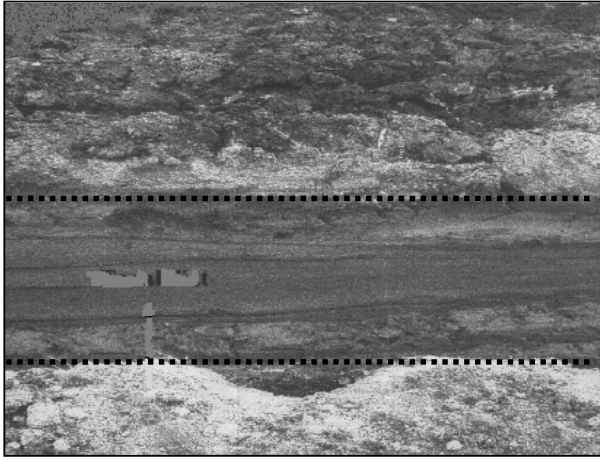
Soil Layer Under Leachate Collection Pond at Pulau Burung Landfill Site.⁶
